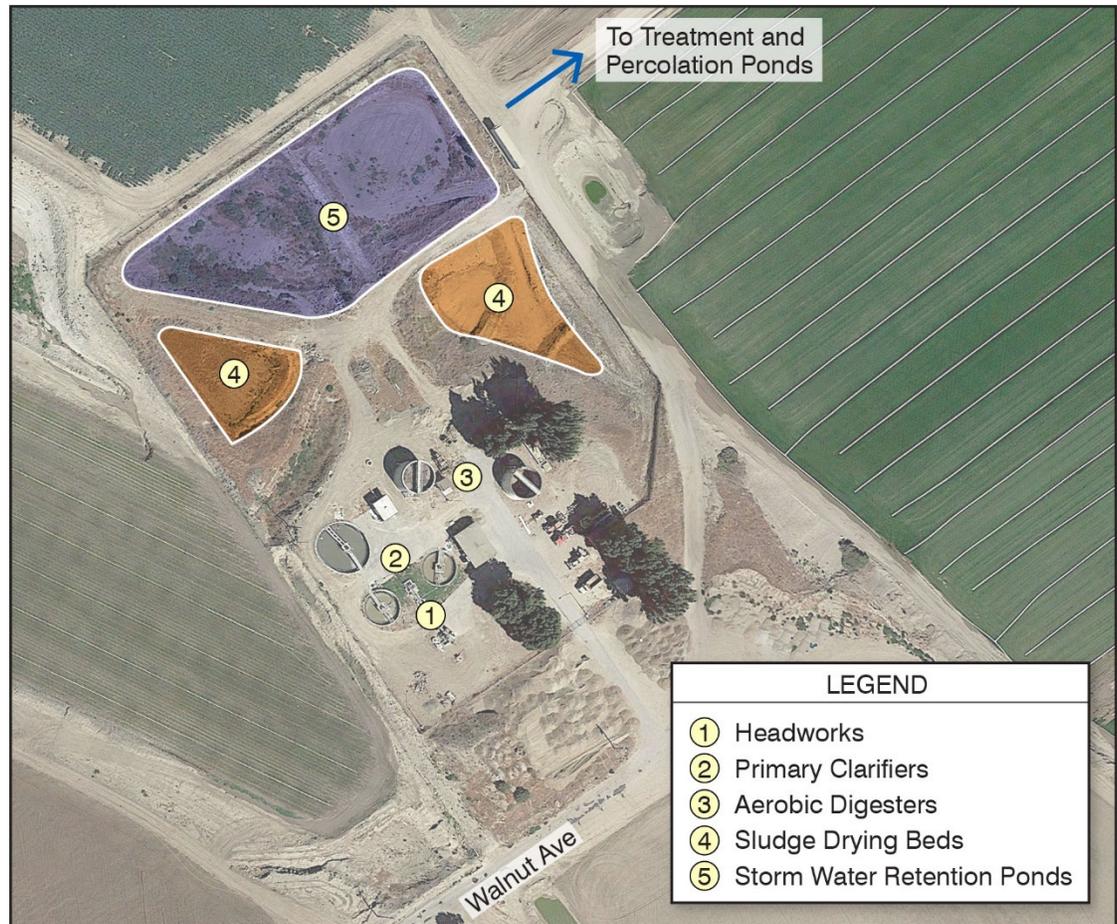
Primary Treatment and Solids Handling Site Layout
